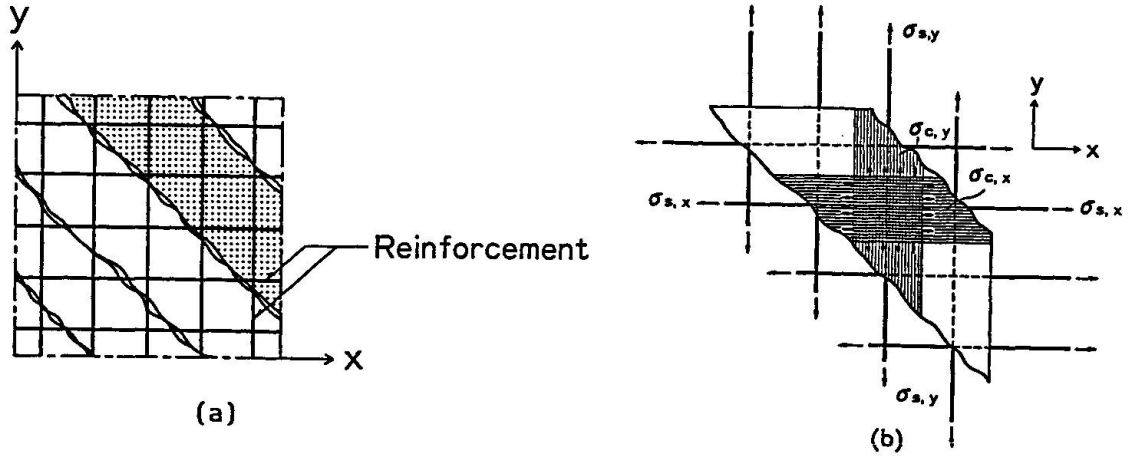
A Cracked Reinforced Concrete Panel
